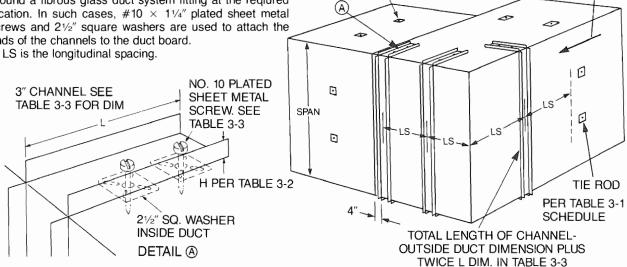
PARTIAL WRAP-AROUND REINFORCEMENT
